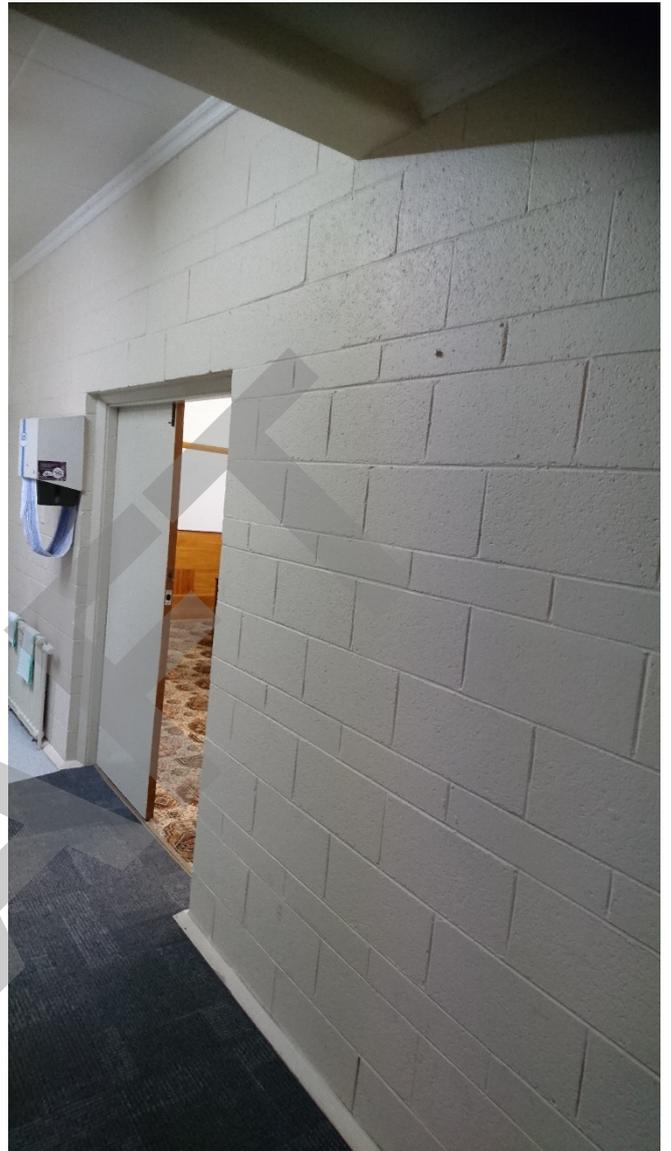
View of concrete block wall with reinforced concrete bond beam and concrete beam spanning overhead; the door leads to the council chambers
